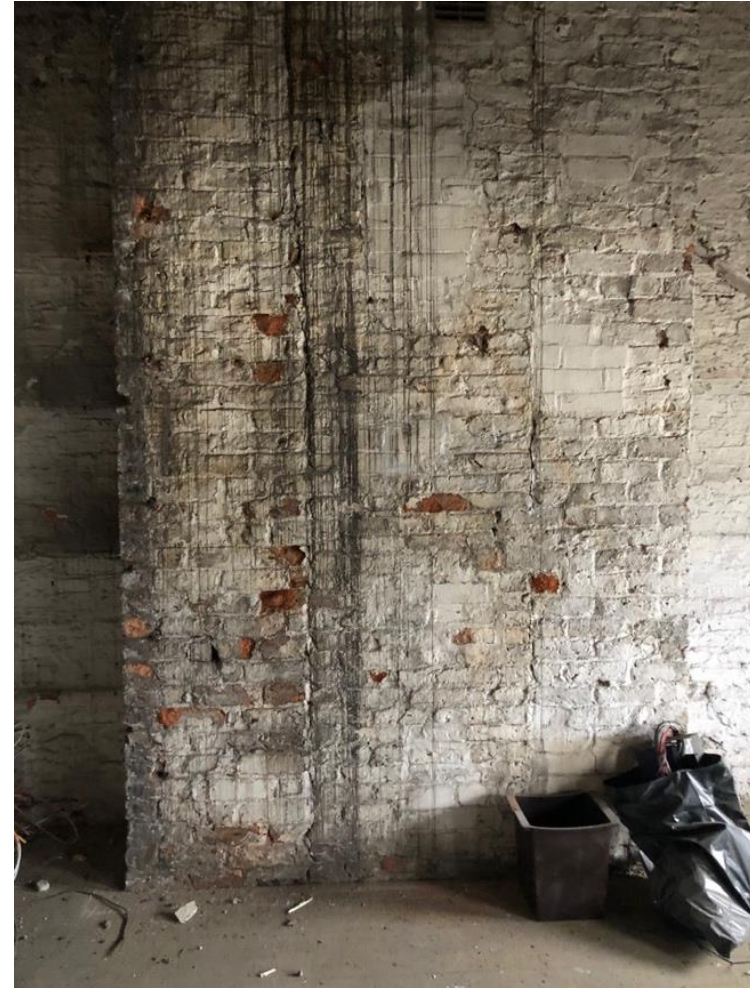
Evidence of staining to the Party Wall chimney stack on the party wall indicating failing in the roof covering or flashing at the abutment, failure assumed to be historic.
